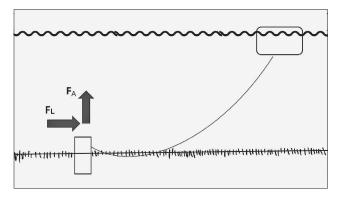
Sketch of Axial and Lateral load on Anchor Pile
